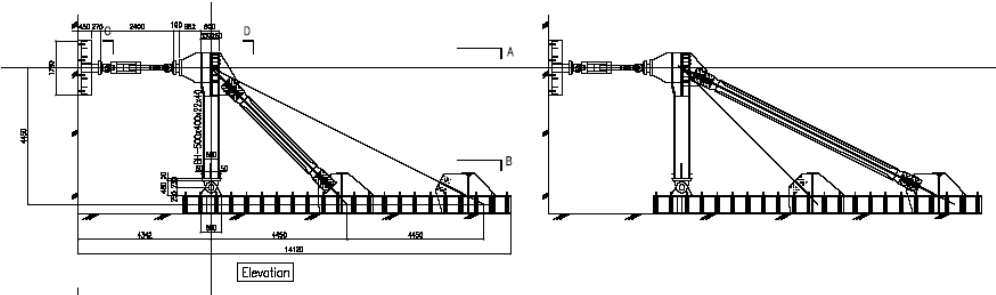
Schematic of Subassembly Test Set-Up for Short and Long Braces
